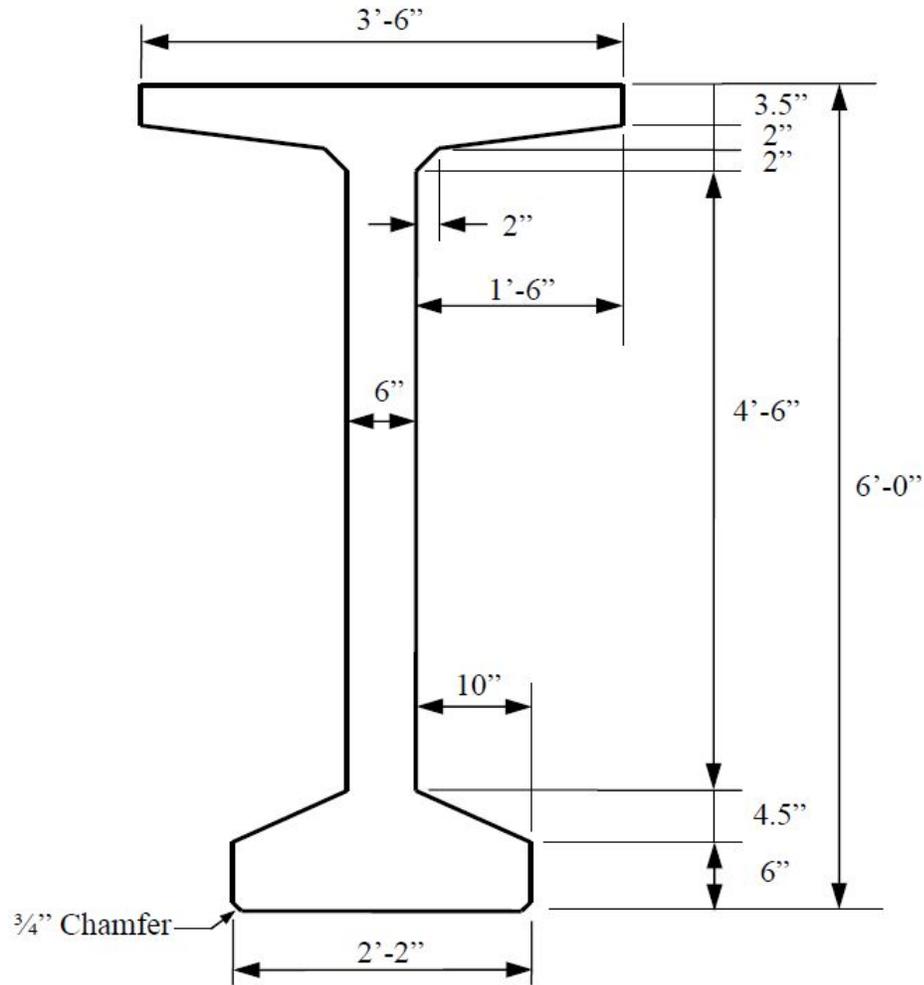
Typical BT-72 girder cross-sectional dimensions
